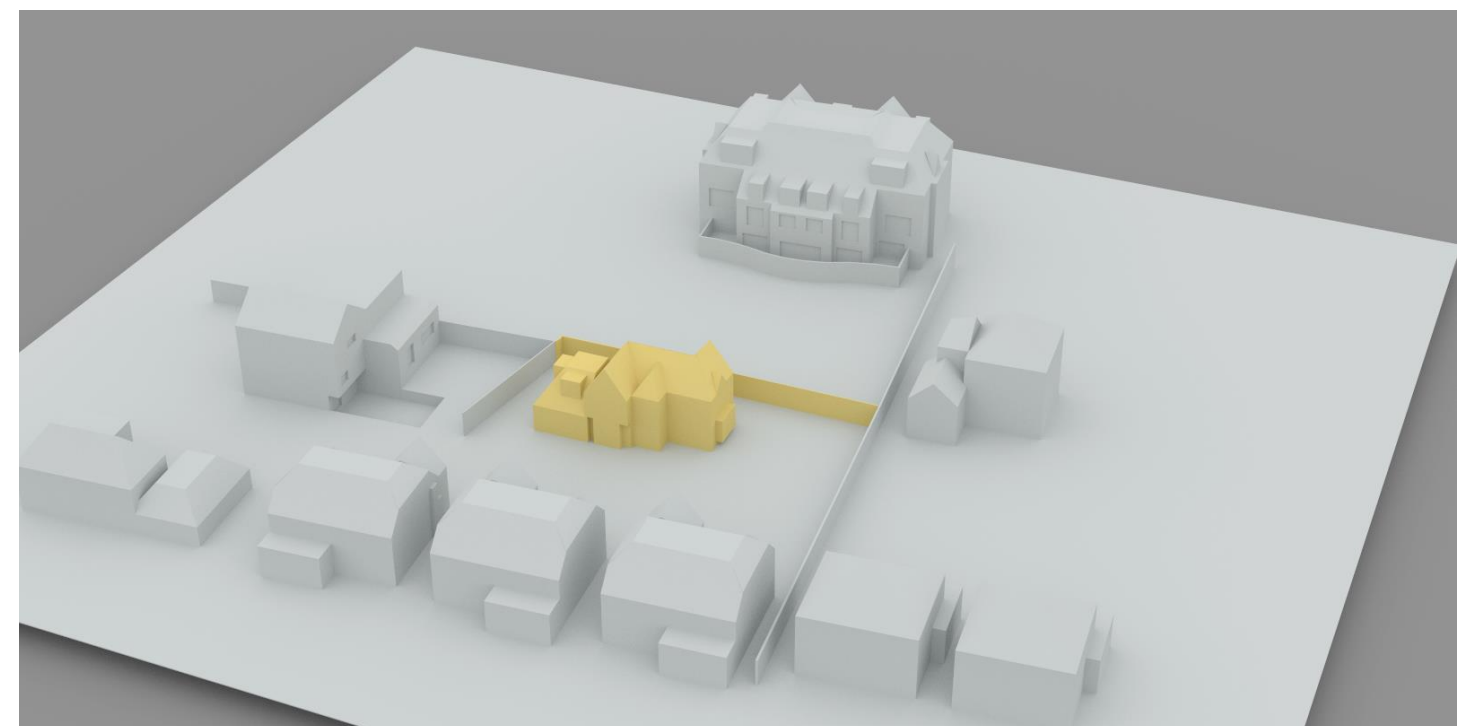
Technical 3D model of 6 Firs Walk and surrounding context with the existing building in place (view from southeast)
